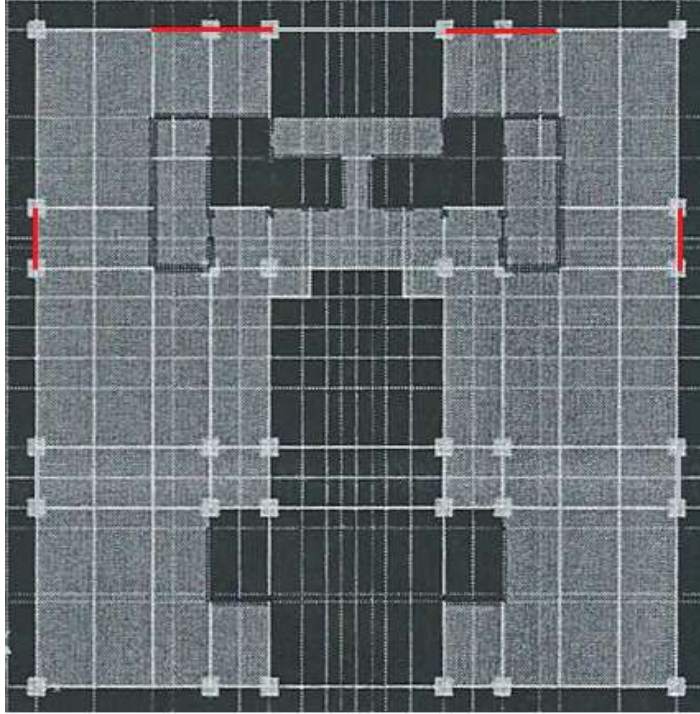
Shear wall, 9" th., placed in elevator shaft
